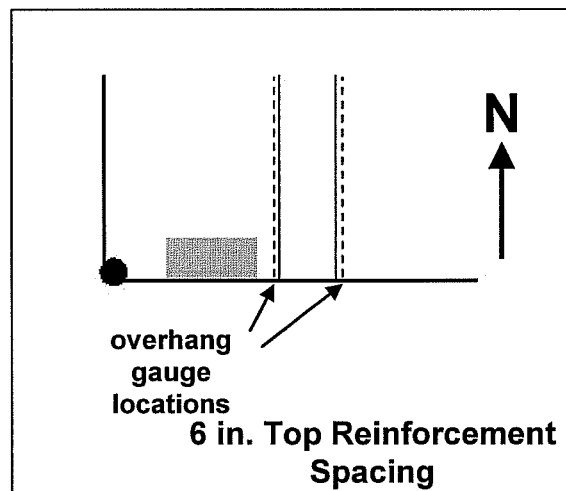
Overhang Test Area 2, 6 in. top reinforcement spacing
